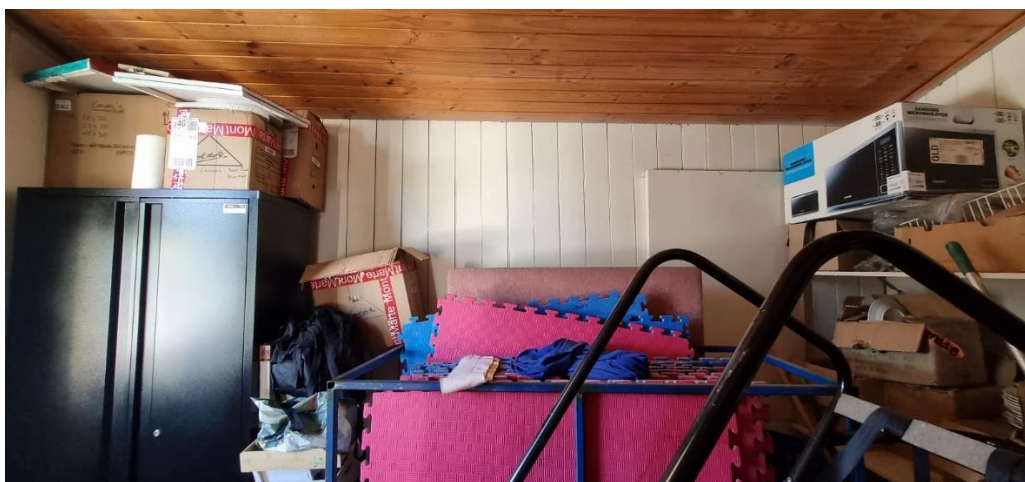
Southern storage room, facing west towards rear of building (taken 1/8/2019)
